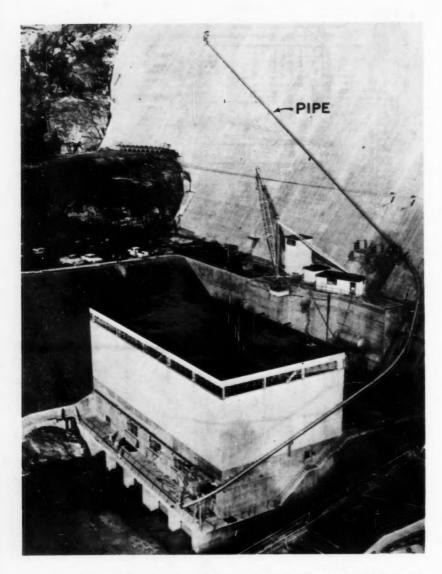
VIEW OF UPPER BAKER DAM AND POWER HOUSE SHOWING SECTION OF FISH TRANSPORTATION PIPE
